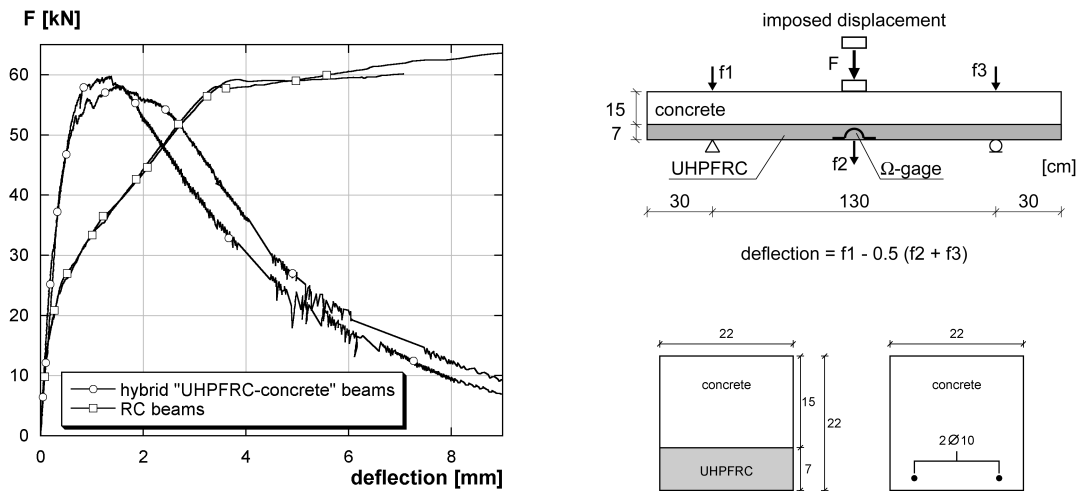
Structural response of composite "UHPFRC-concrete" beams in comparison to reinforced concrete beams (after [Denarie03])
